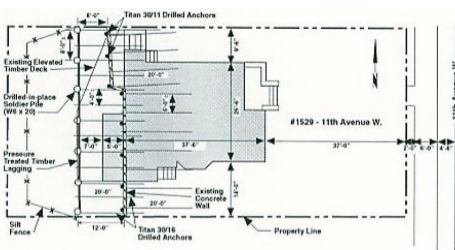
Plan view of the house, the two retaining structures, and the anchors.
